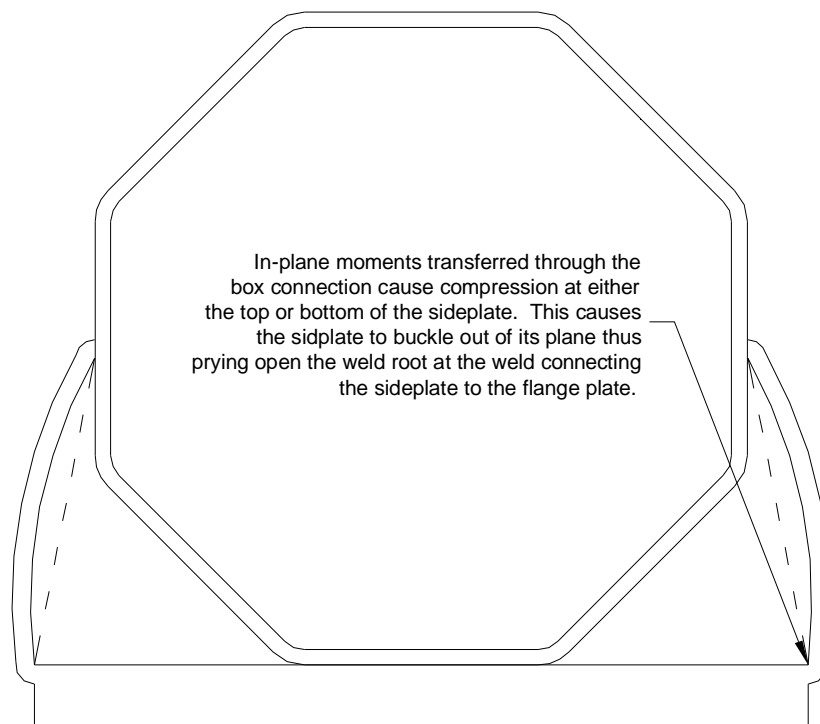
Cross-section of box connection depicting side plate deformation under in-plane loading.
